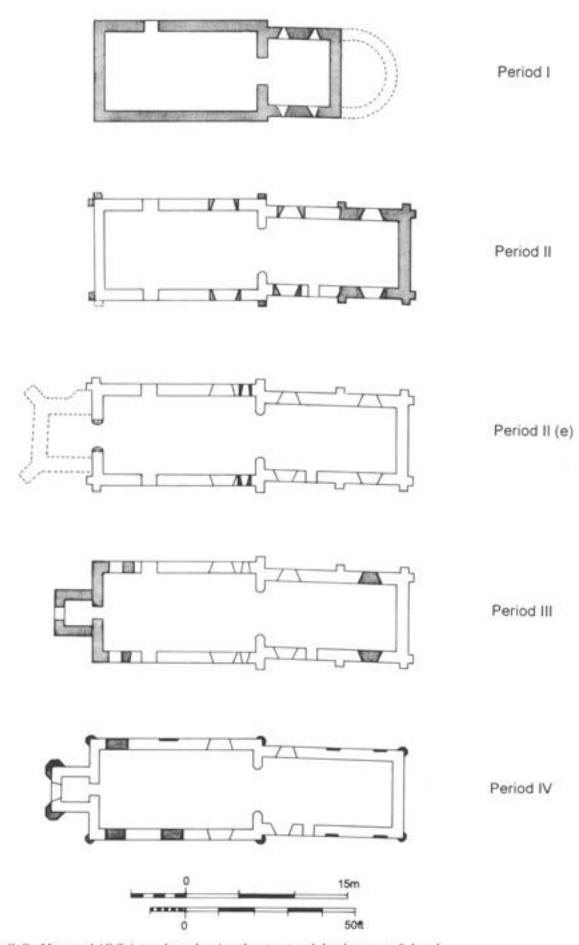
Rivenhall, St. Mary and All Saints, plans showing the structural development of church.
